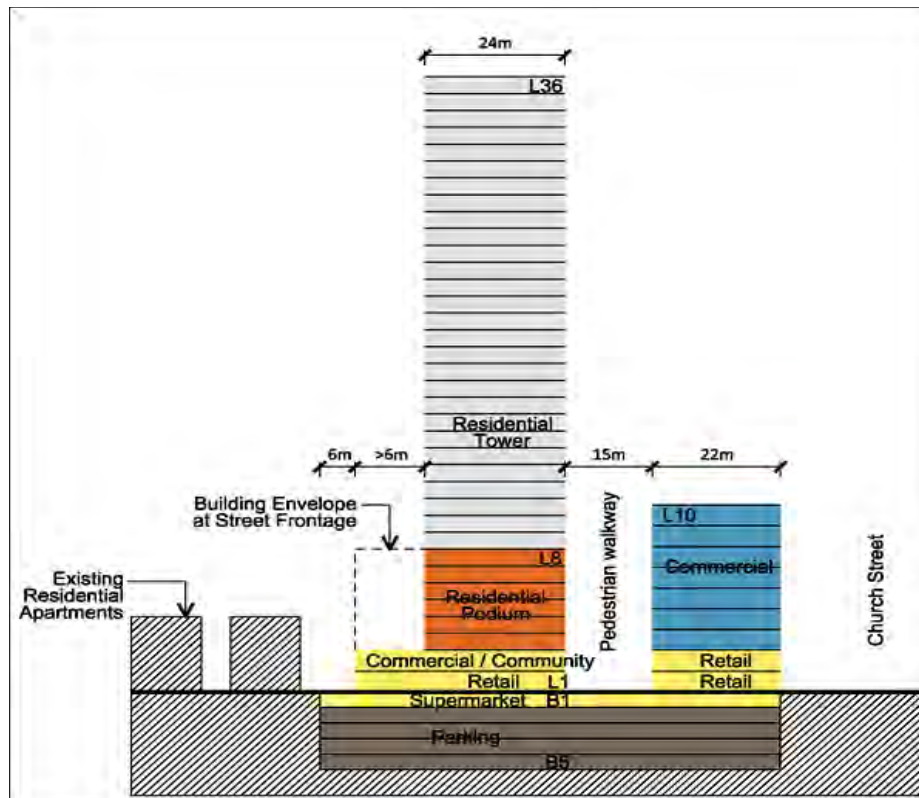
Building Form Control Section (Northern Side)
